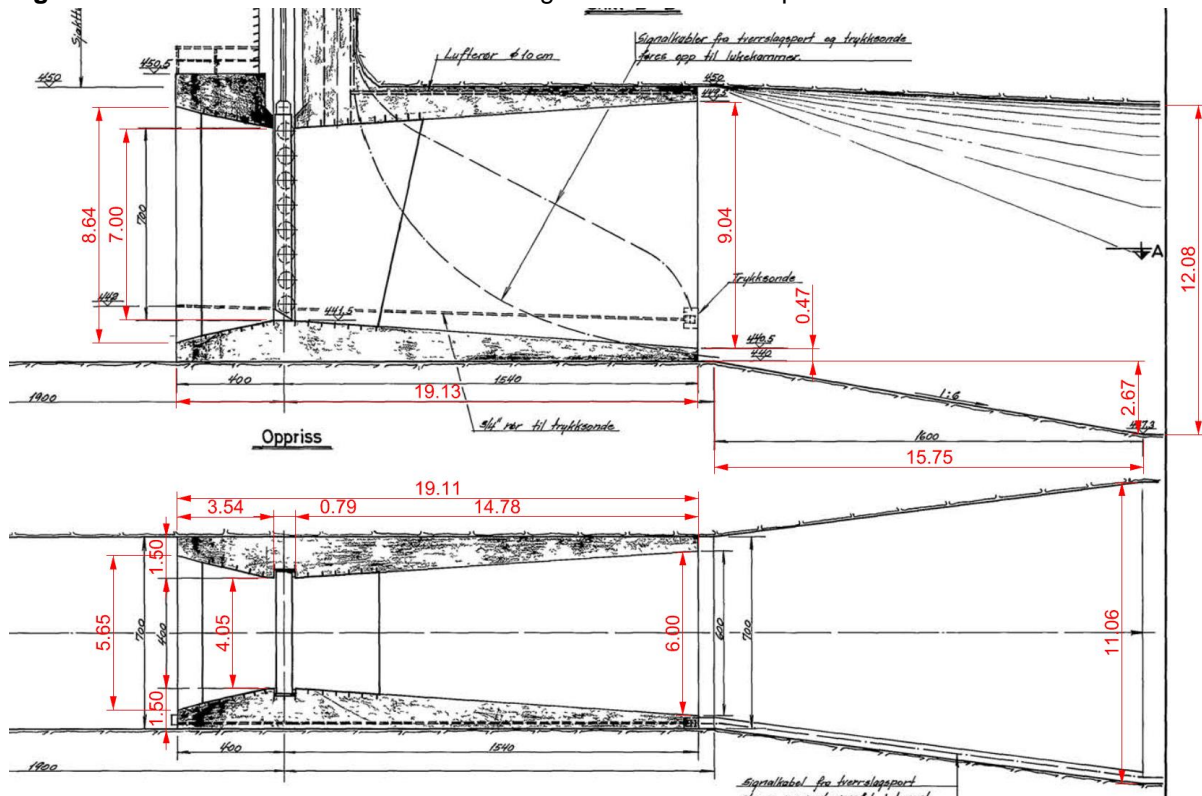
section View and Ground view of gate inlet of sand trap No. 3, with dimensioning
